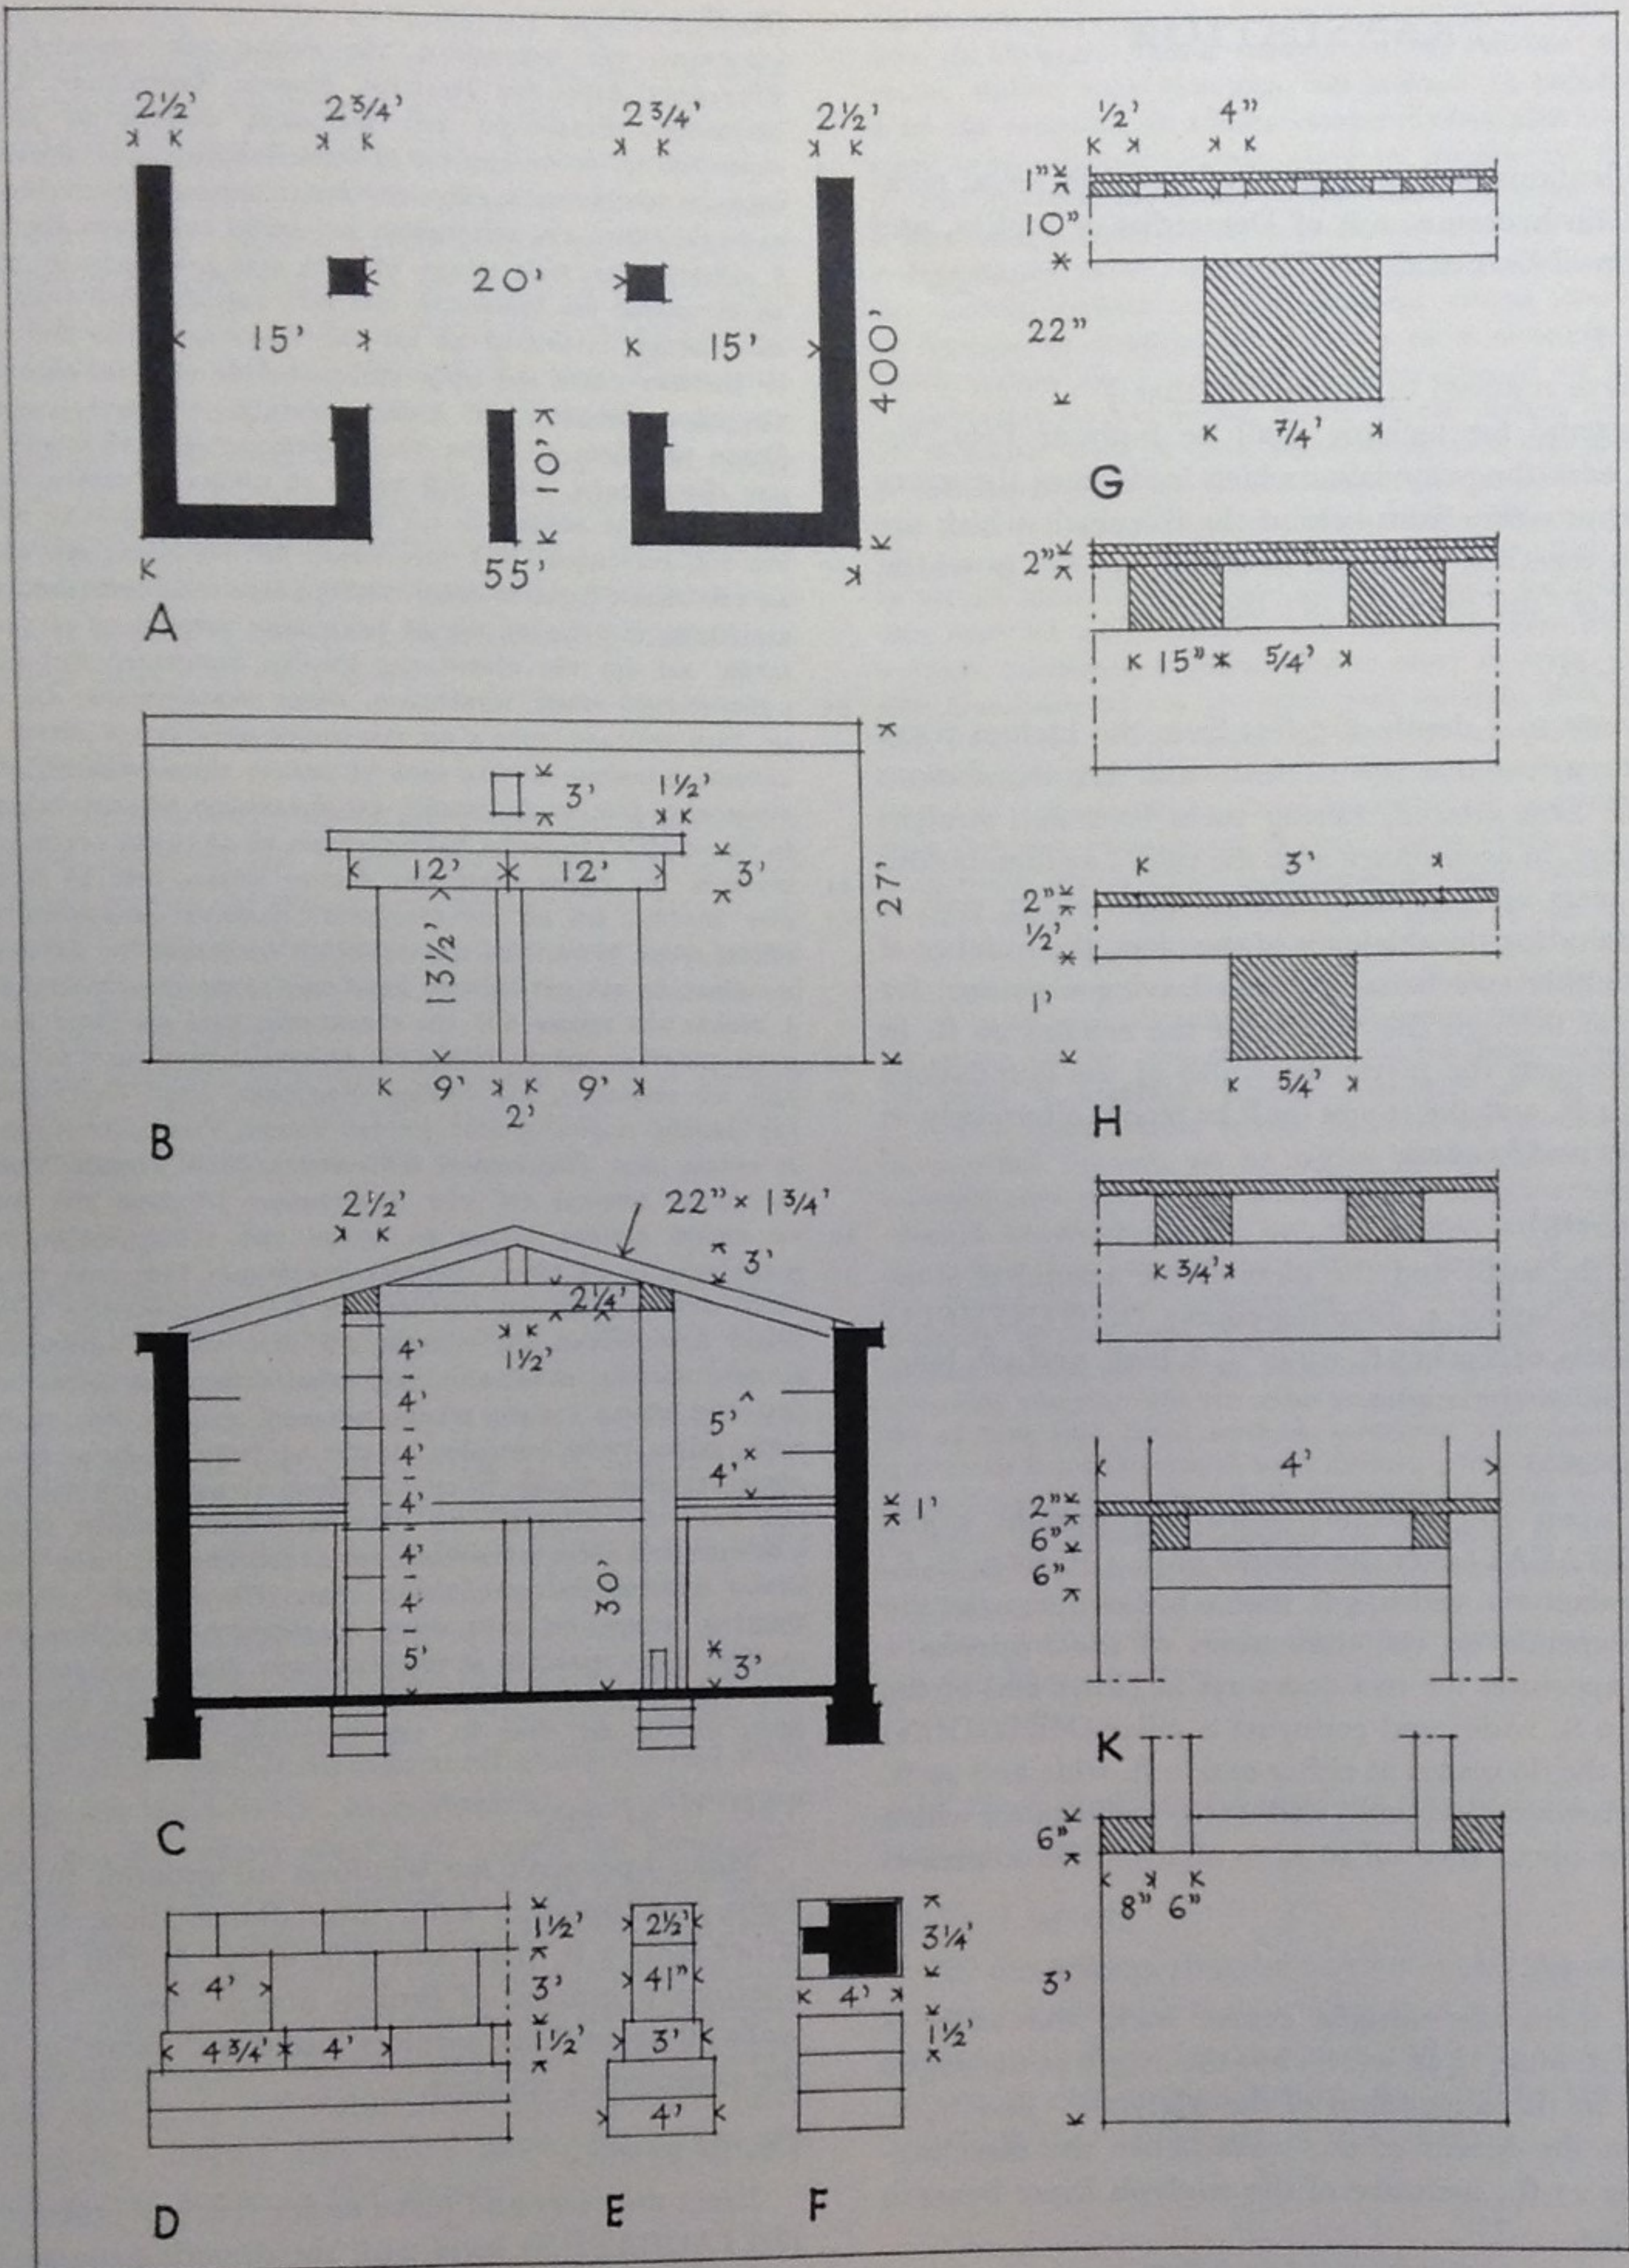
The measurements given in the Arsenal inscription. A: ground plan. B: front elevation. C: cross section. D-F: dimensions of walls and piers. G-K: timber constructions. G: roof. H: midway galleries. K: shelves above the midway galleries. (K.J.).
